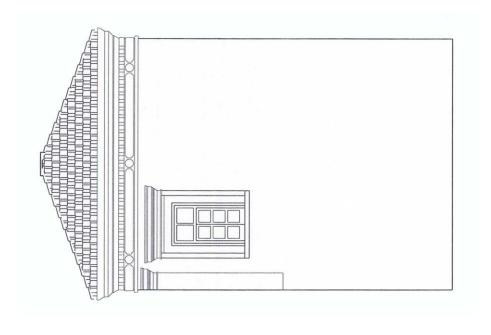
Right Elevation of 11-Hamam Street Scale: 1/75
